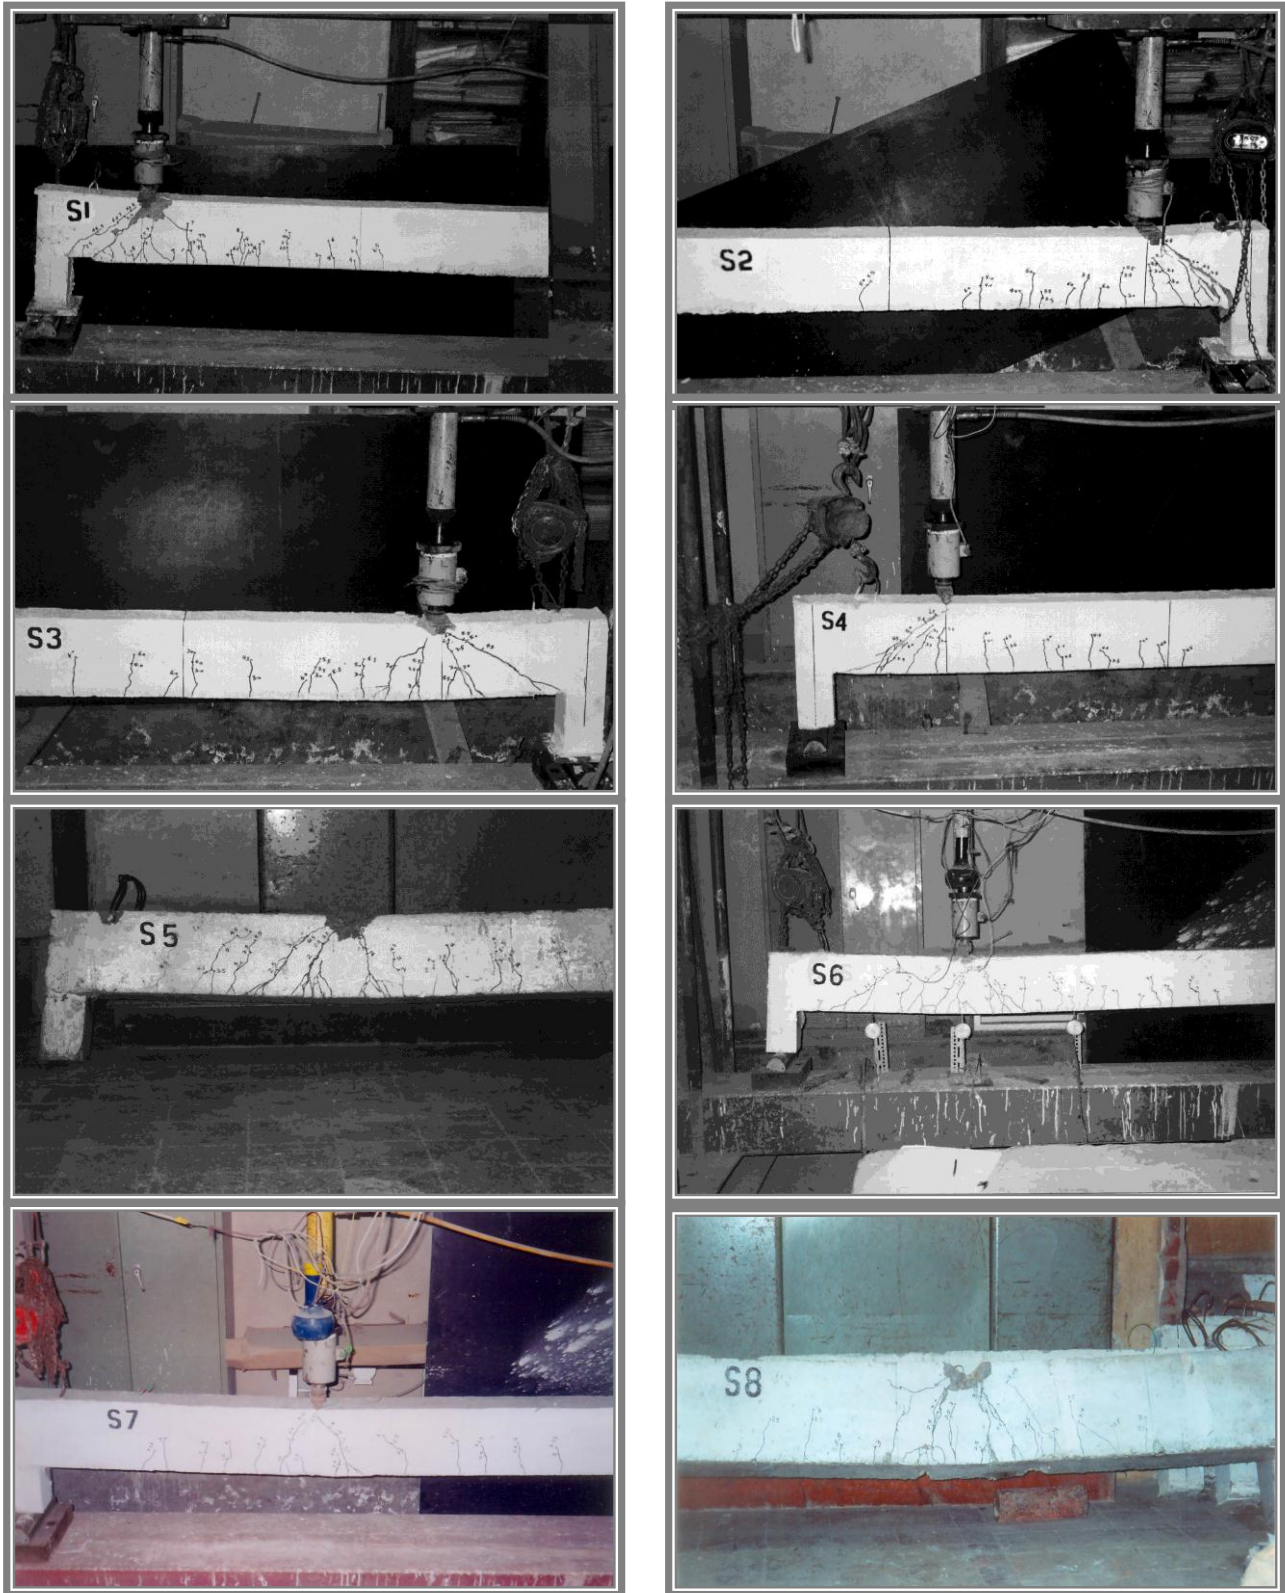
Cracking patterns after failure for tested normal strength concrete beams with stirrups in group "N".
